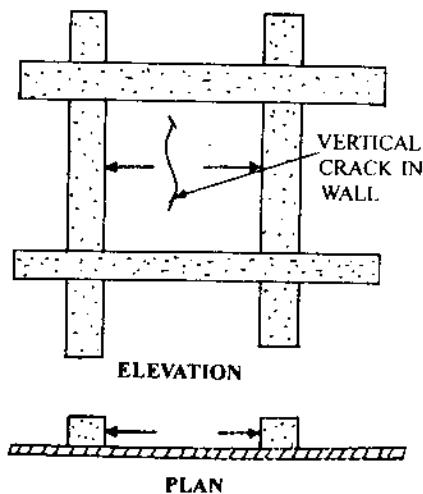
Vertical crack in brick pannel of a framed structure
